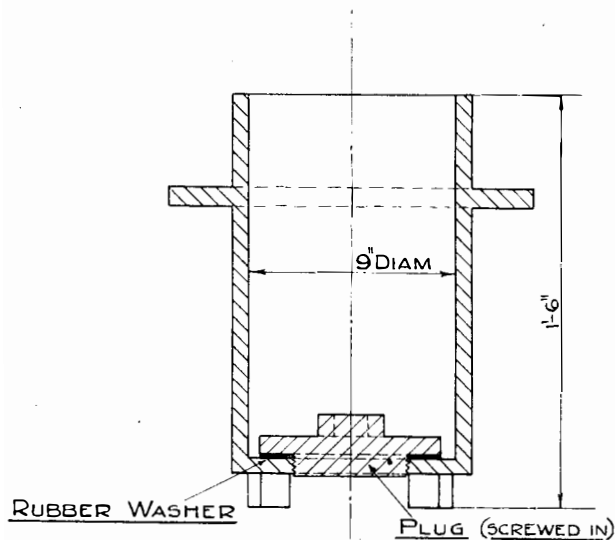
ENLARGED VIEW OF SPECIAL SUMP PIPE SHOWN IN FIG. 1.
